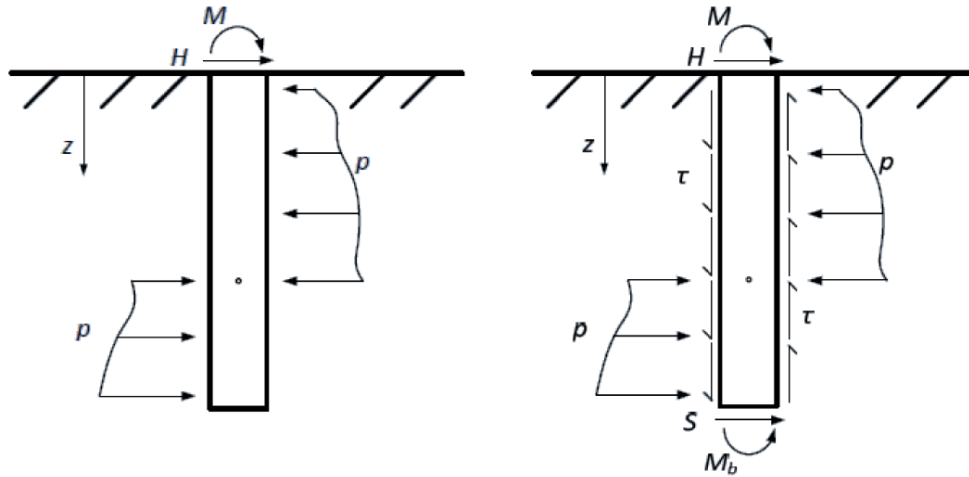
Current and new method with additional soil reactions acting on short piles (Foursoff, 2018)
